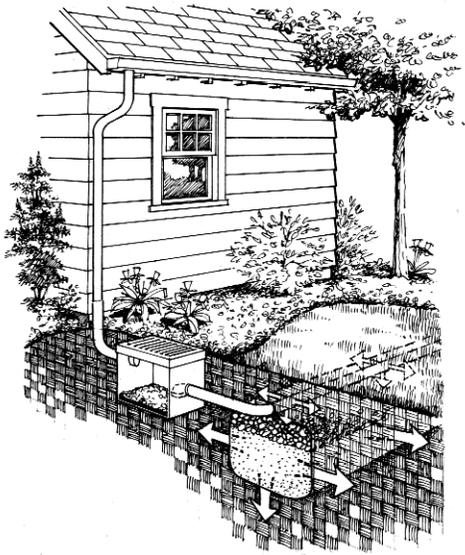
Soakage Trench illustration. See Appendix G.1, SW-180 and SW-181, for typical soakage trench details.
